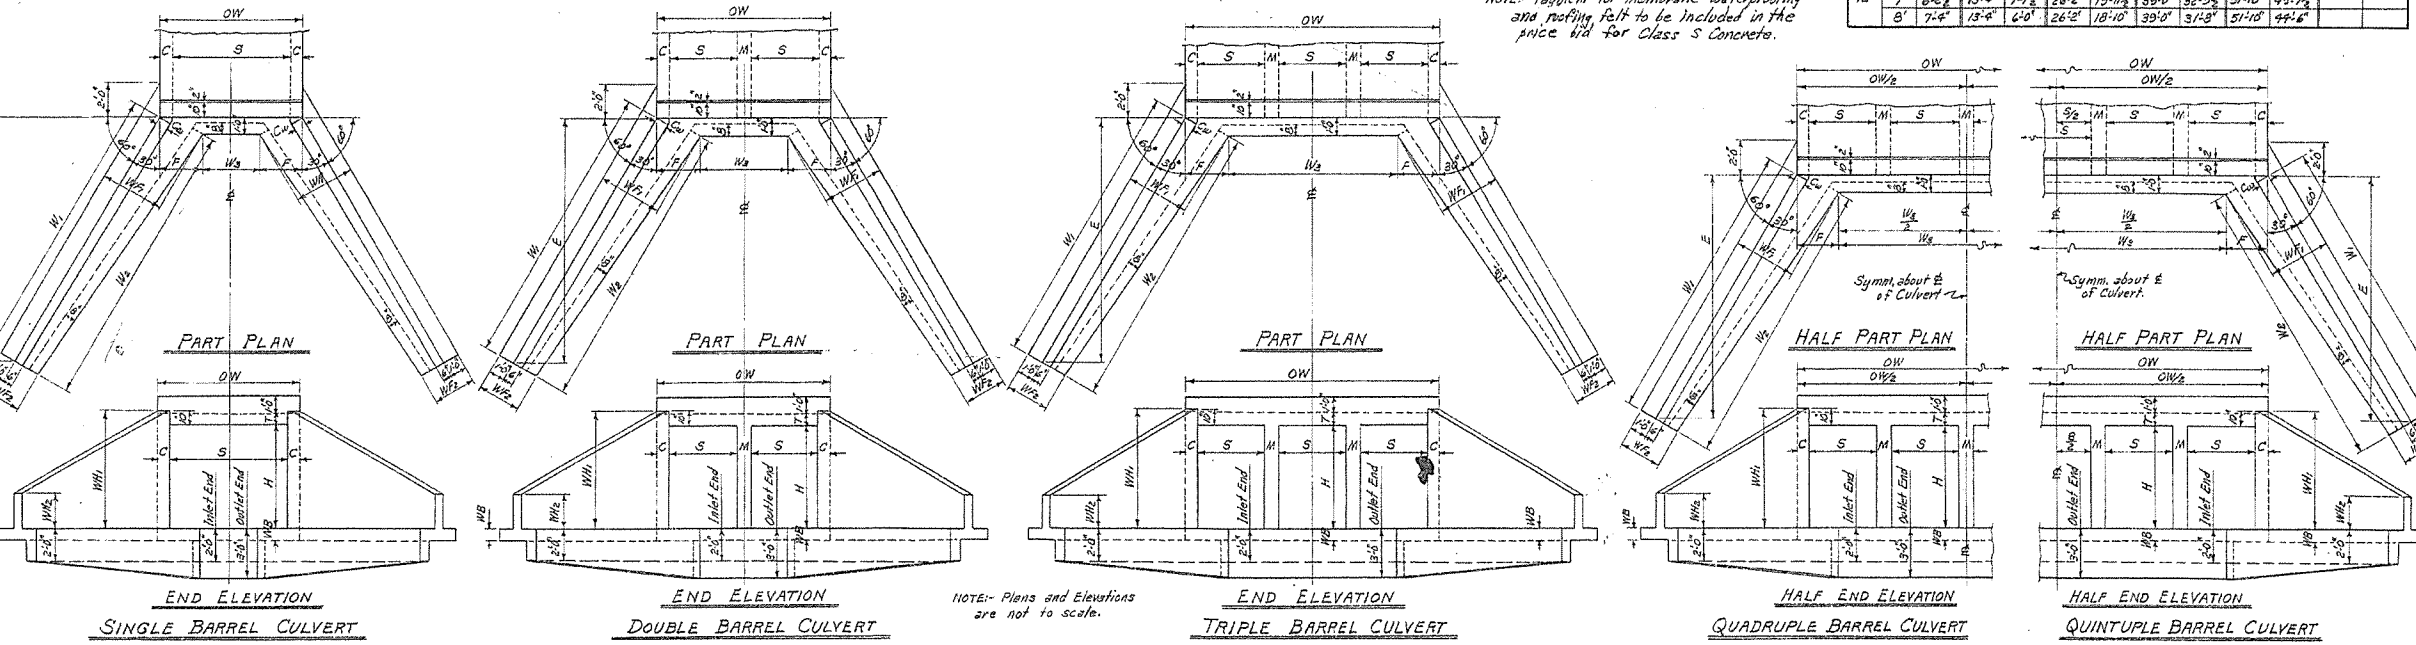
DETAILS OF STANDARD WINGS FOR REINFORCED CONCRETE BOX CULVERTS
